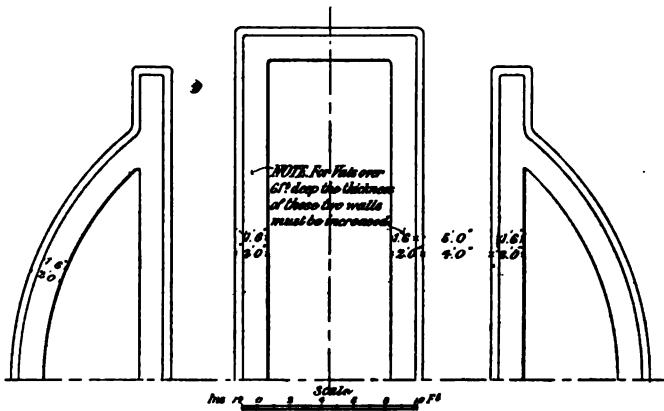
Pier with Projections for carrying Staging; Half Plan.
